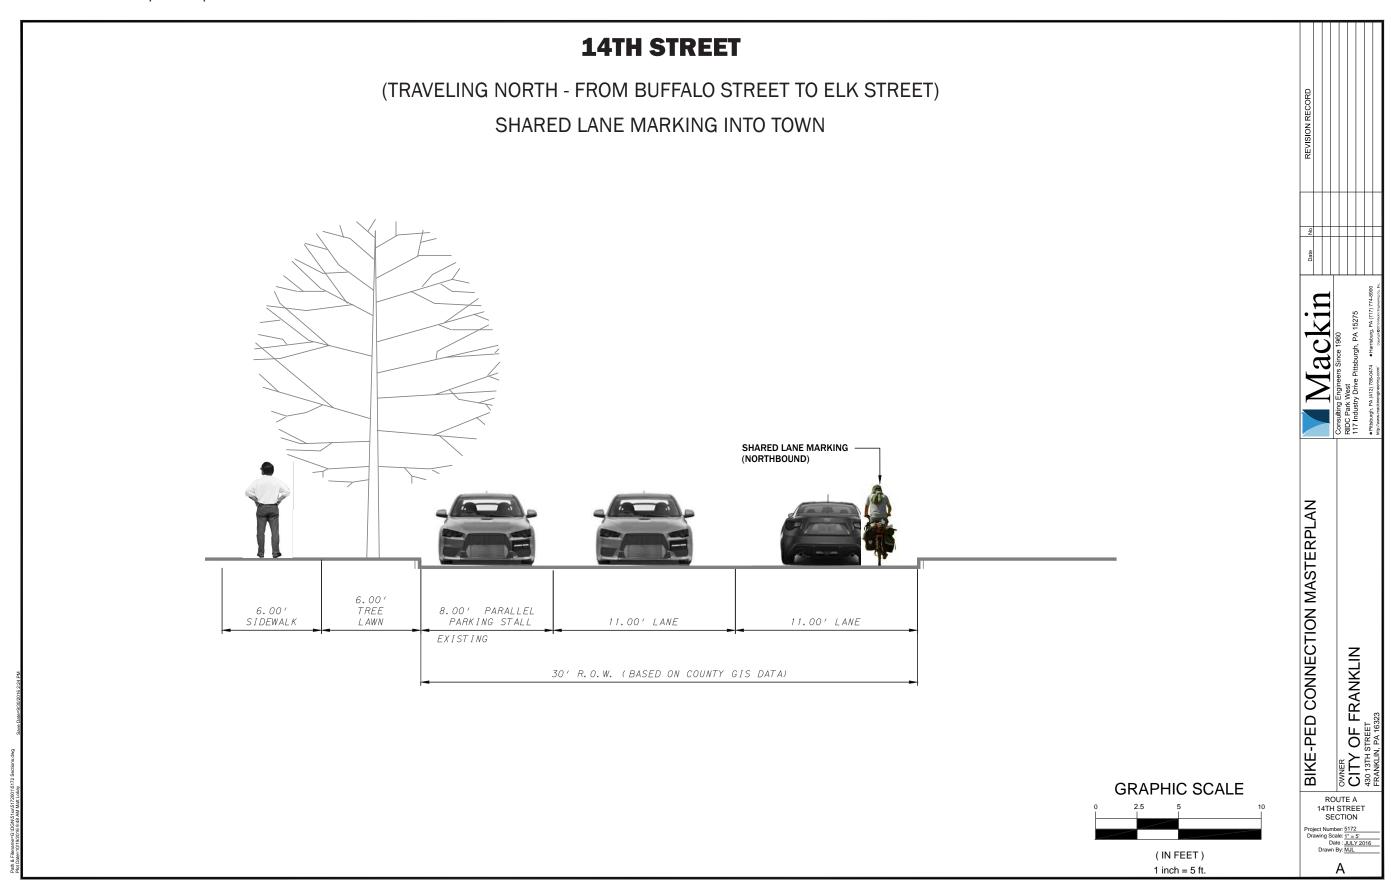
Cross Section of Proposed Improvements to 14th Street between Buffalo and Elk Streets
